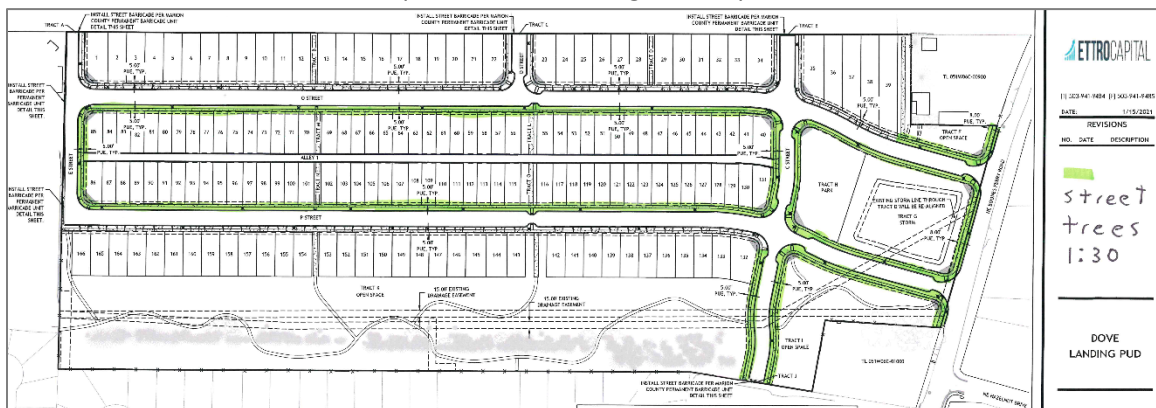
Street Tree Min No. (green: equal to 1 tree per 30 ft of block frontage)
